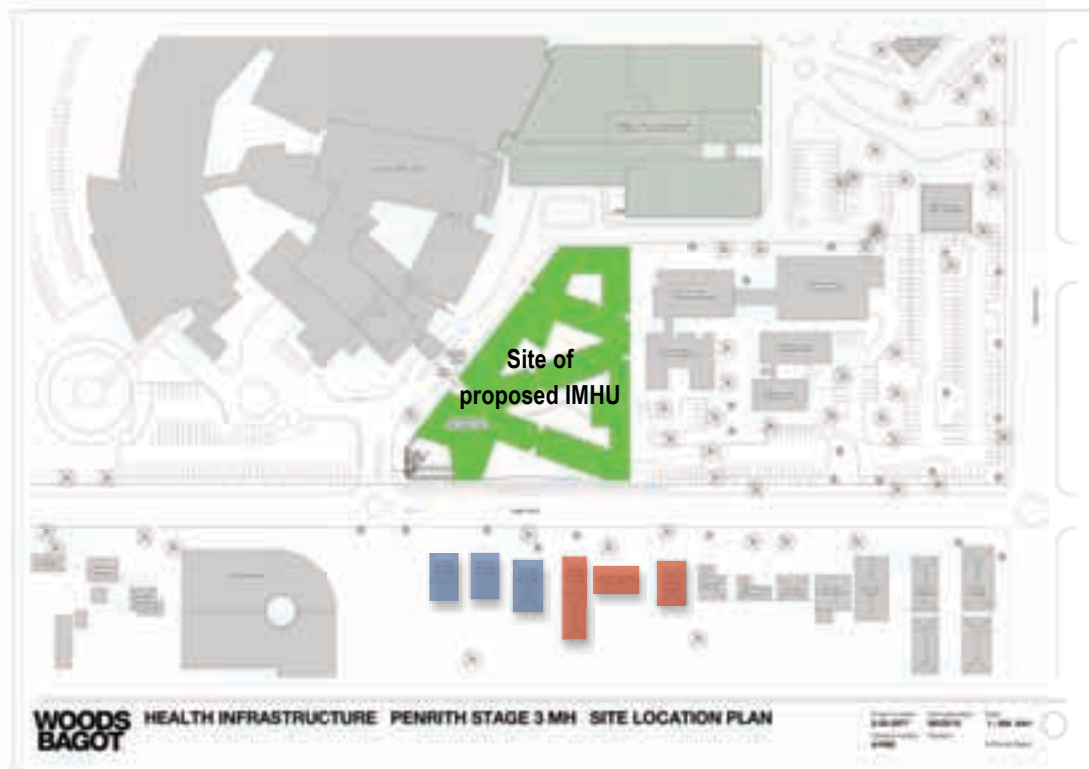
Detailed Site Plan showing site of proposed IMHU and nearest residences
